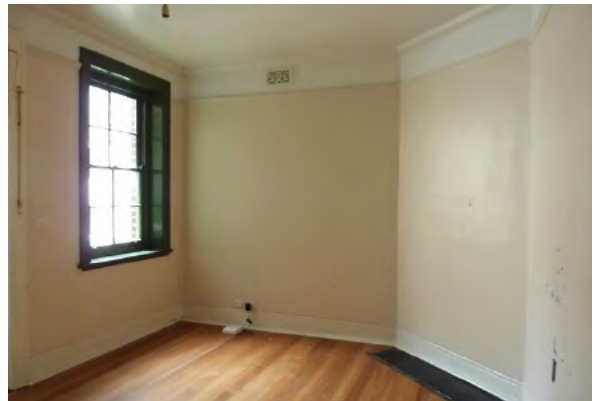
Living room (space G.3) showing the timber floors, double-hung window, moulded timber picture rail and plasterboard ceiling—56B / 46–56 Gloucester Street. (Source: GML Heritage, November 2015)
